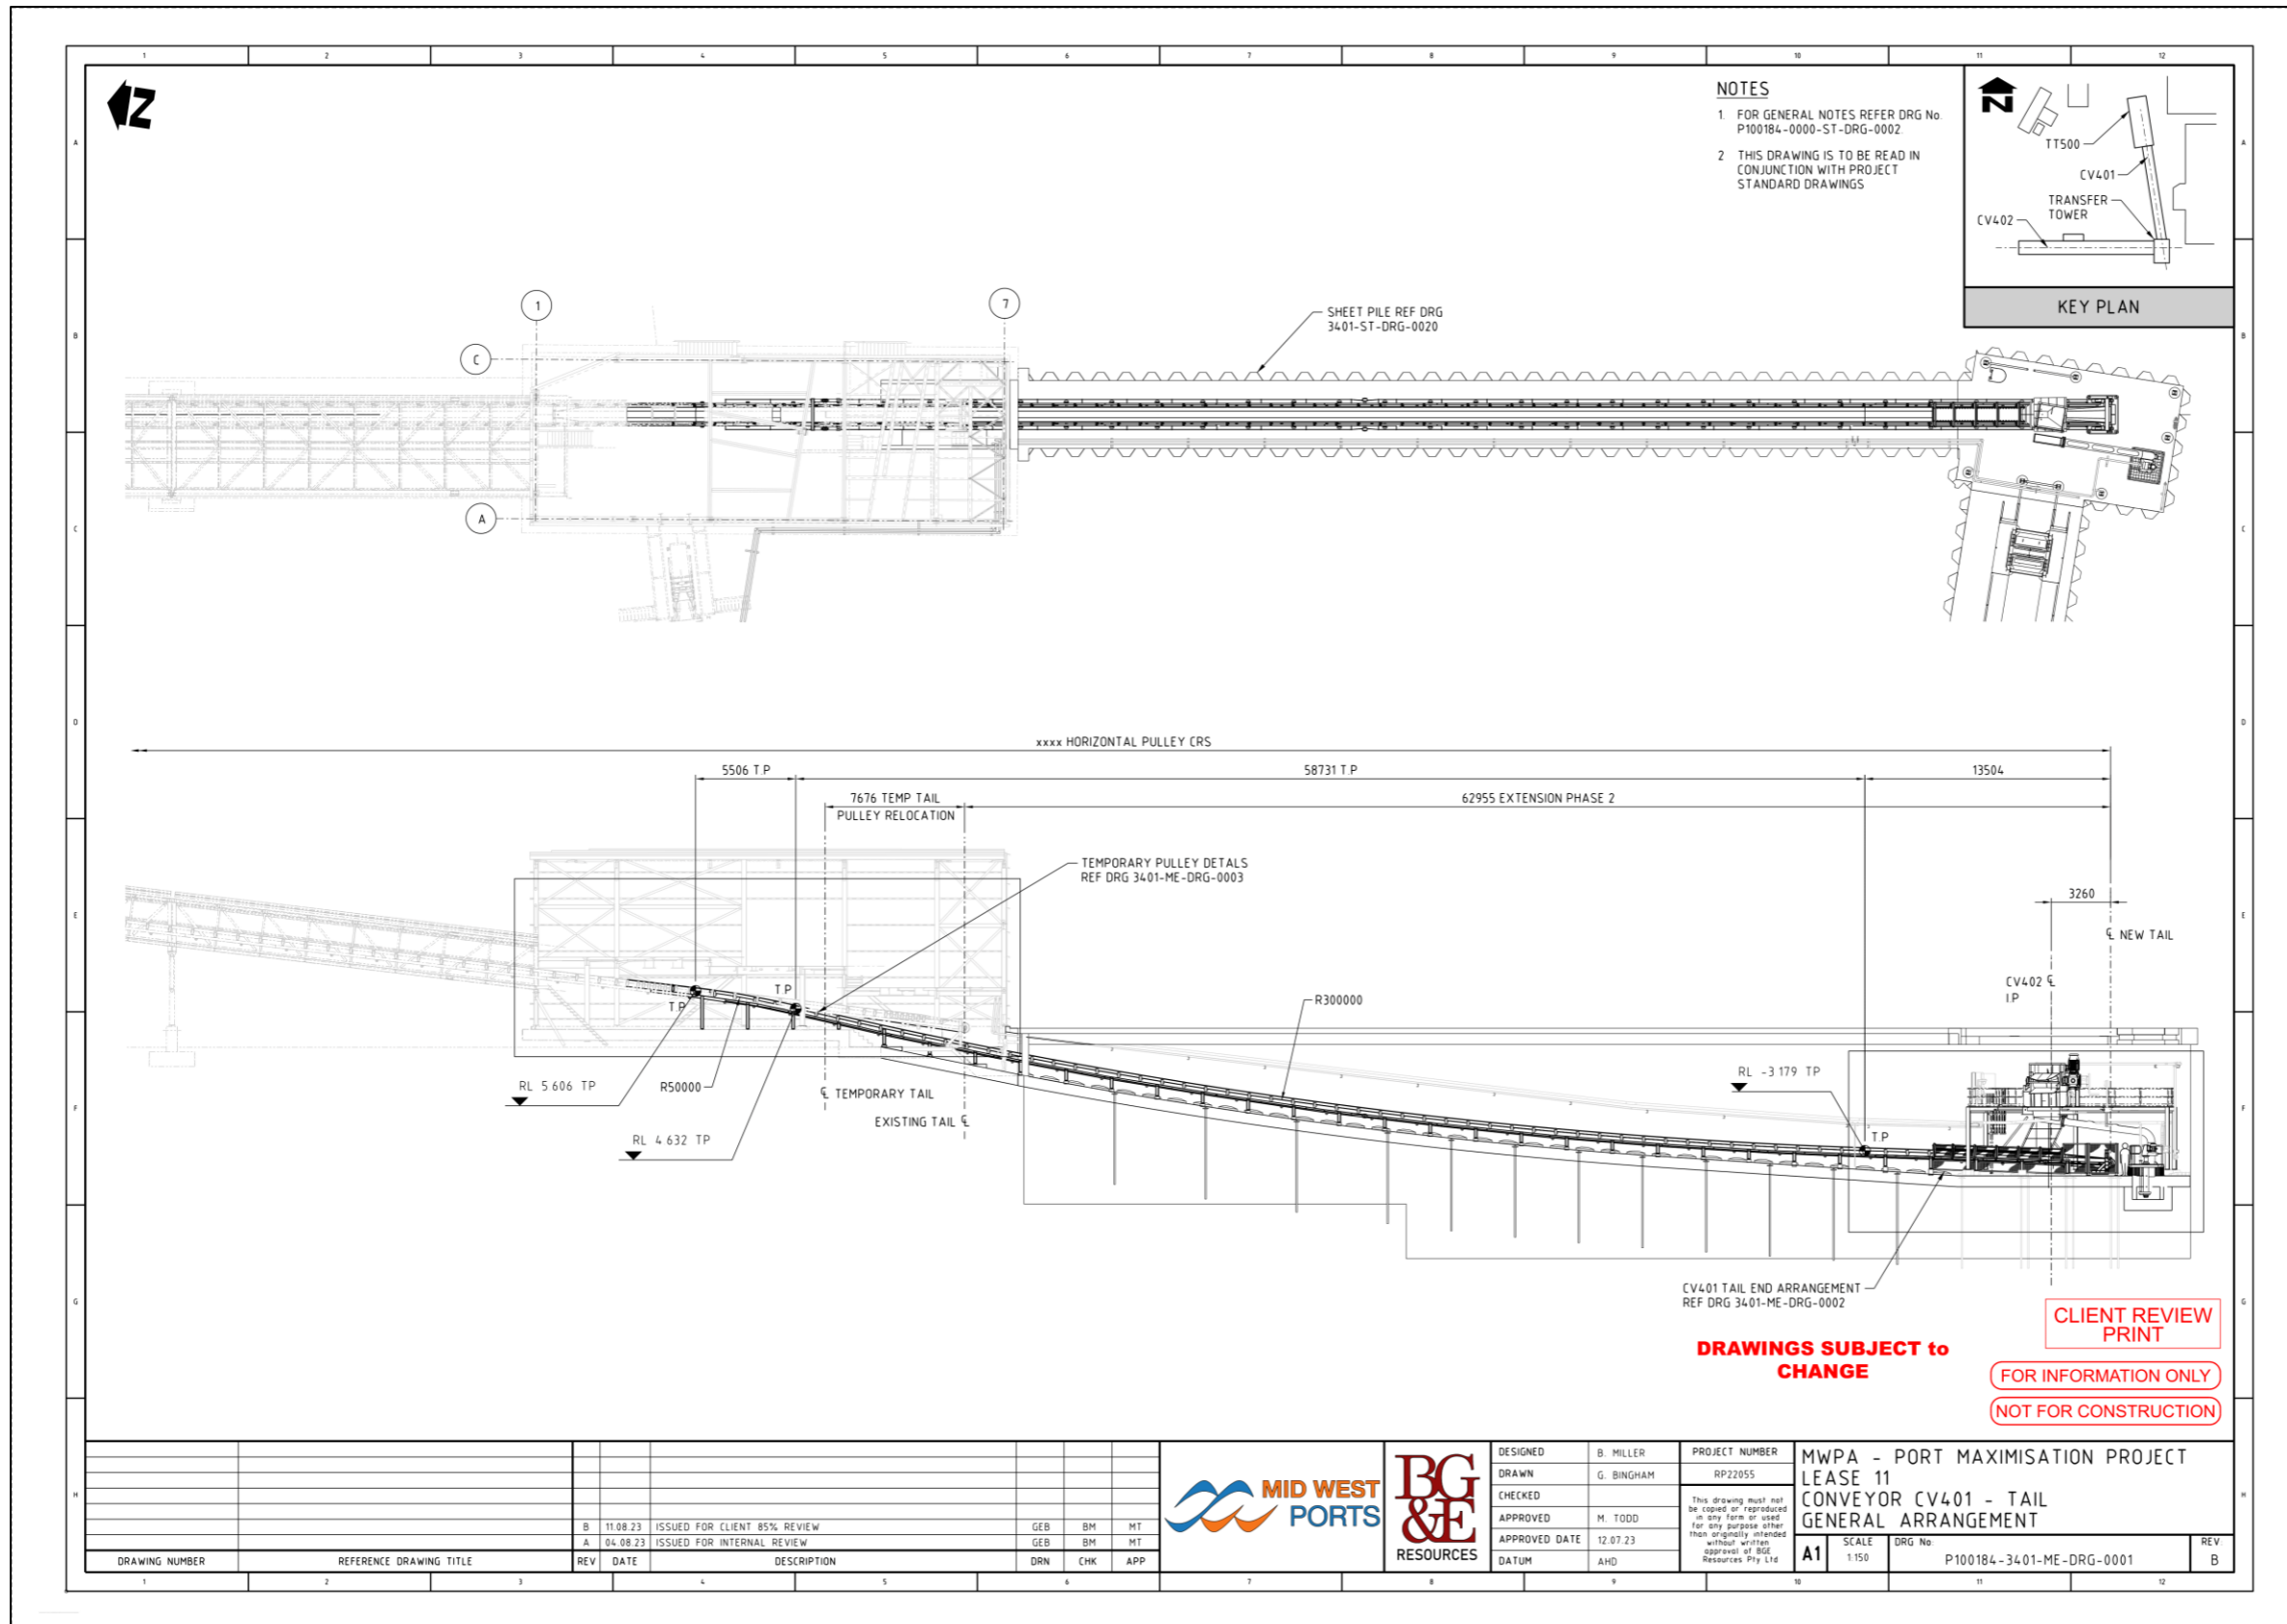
Construction drawing for conveyor CV401 extension – general arrangement
